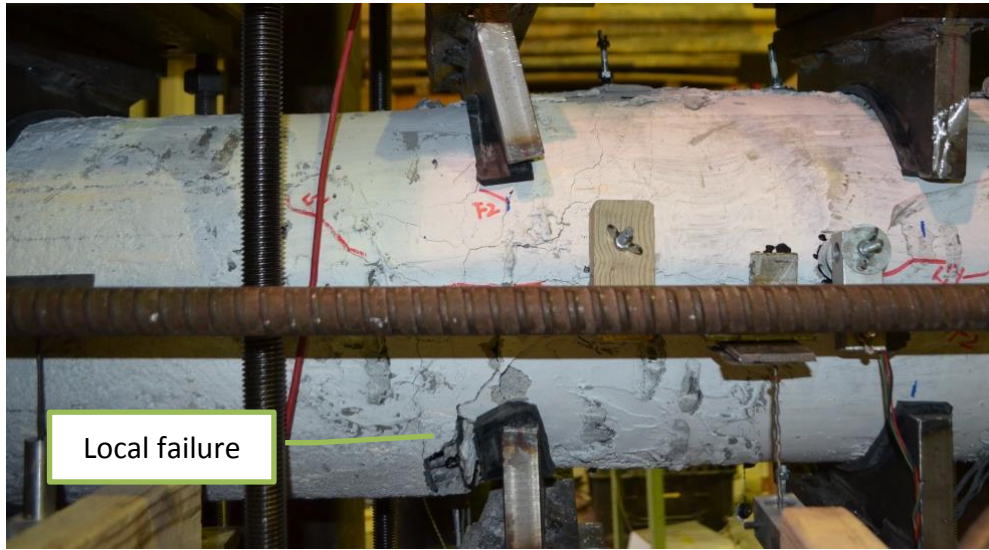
Specimen H1C3-C Local Failure near Loading Point
